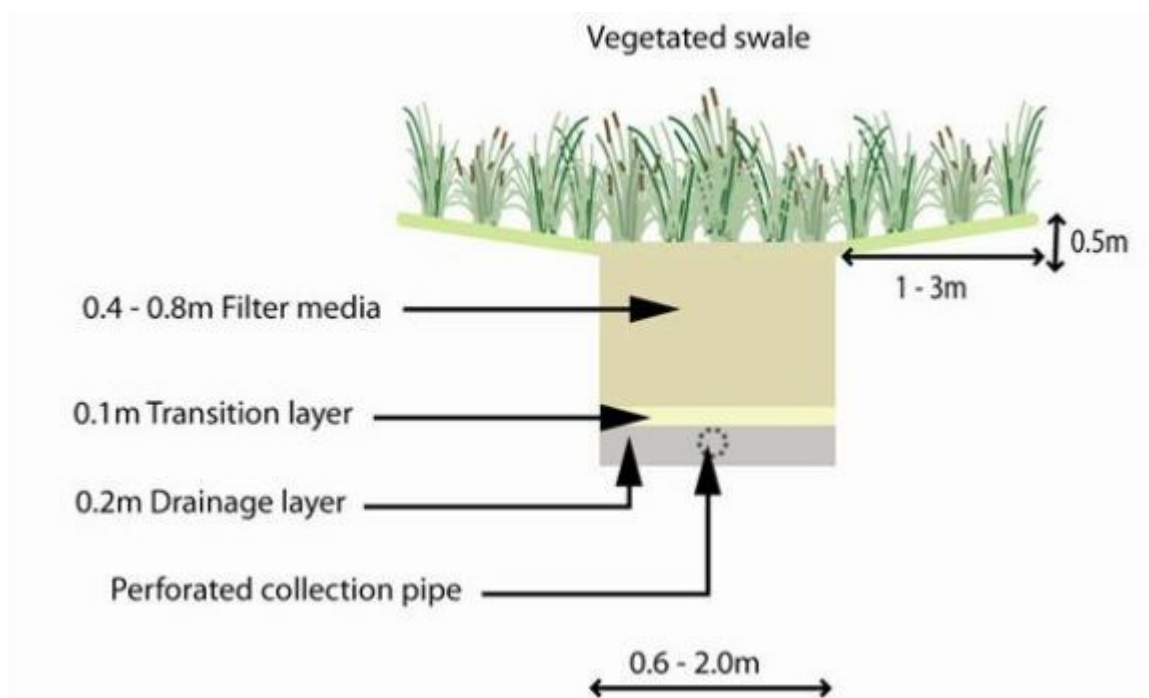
Typical section of a bioretention swale
